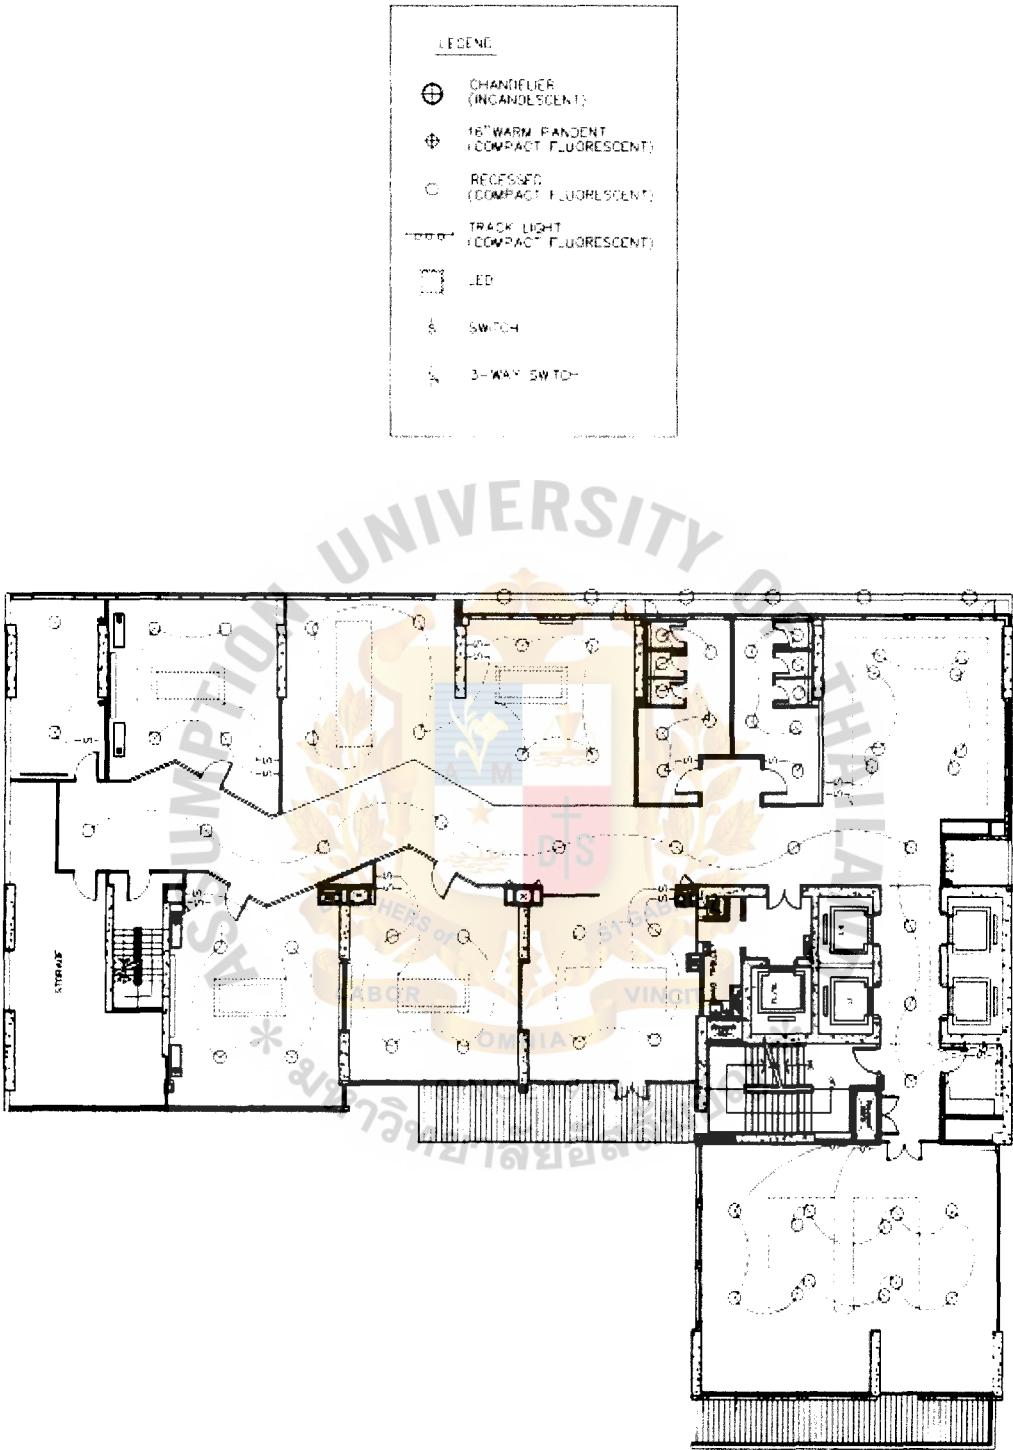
Reflected Ceiling and Lighting Plan of 6th floor plan
